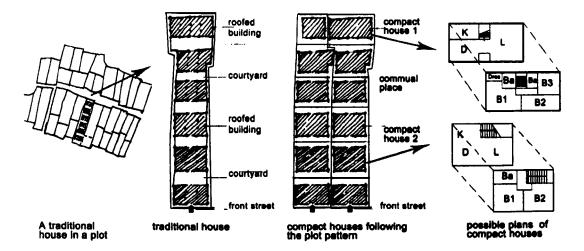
Lay new compact houses according to the plot type and block type; compact houses should form communal spaces that are similar to traditional courtyards; possible layouts of compact houses are various depending on specific requirements of households (by the author)
